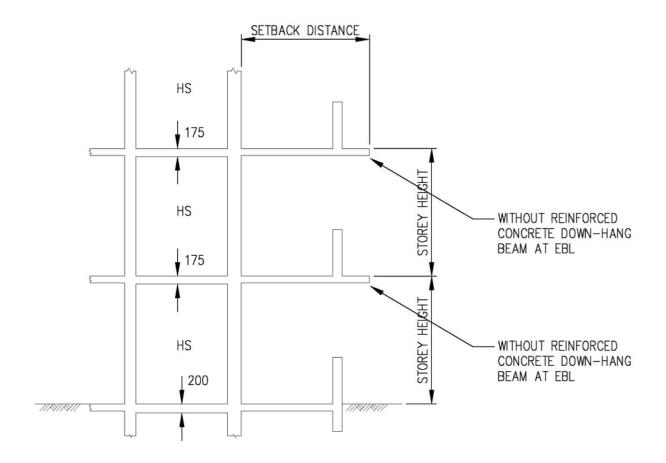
(i) REQUIREMENT ON SETBACK DISTANCE OF HS WALL (WITHOUT DOWN-HANG BEAM)
